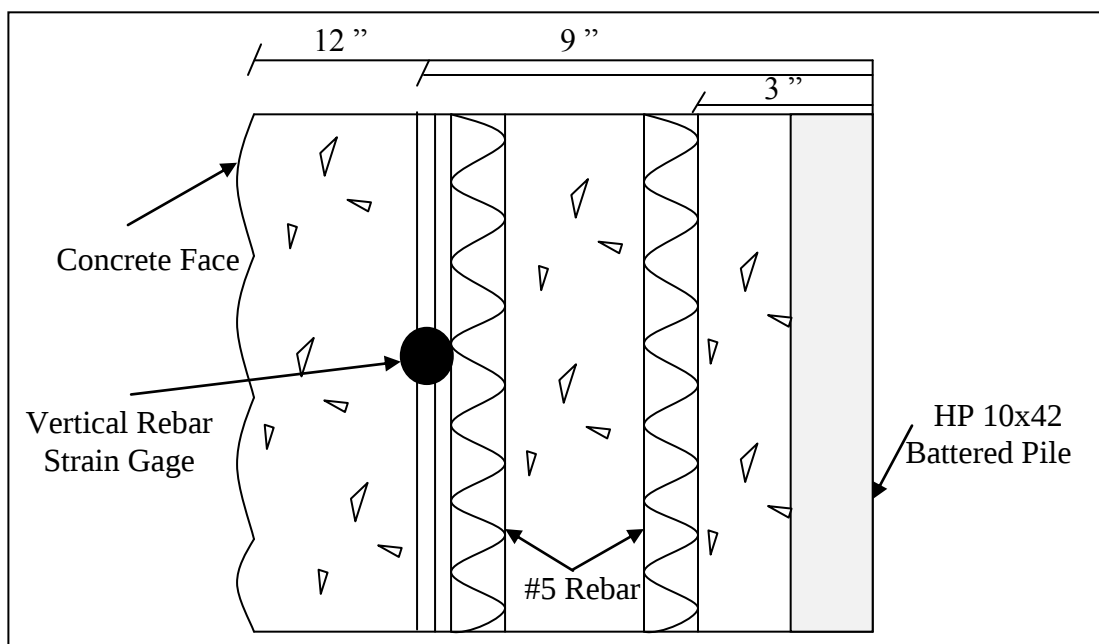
Cross Section Detail at the Battered Pile of Test Section
